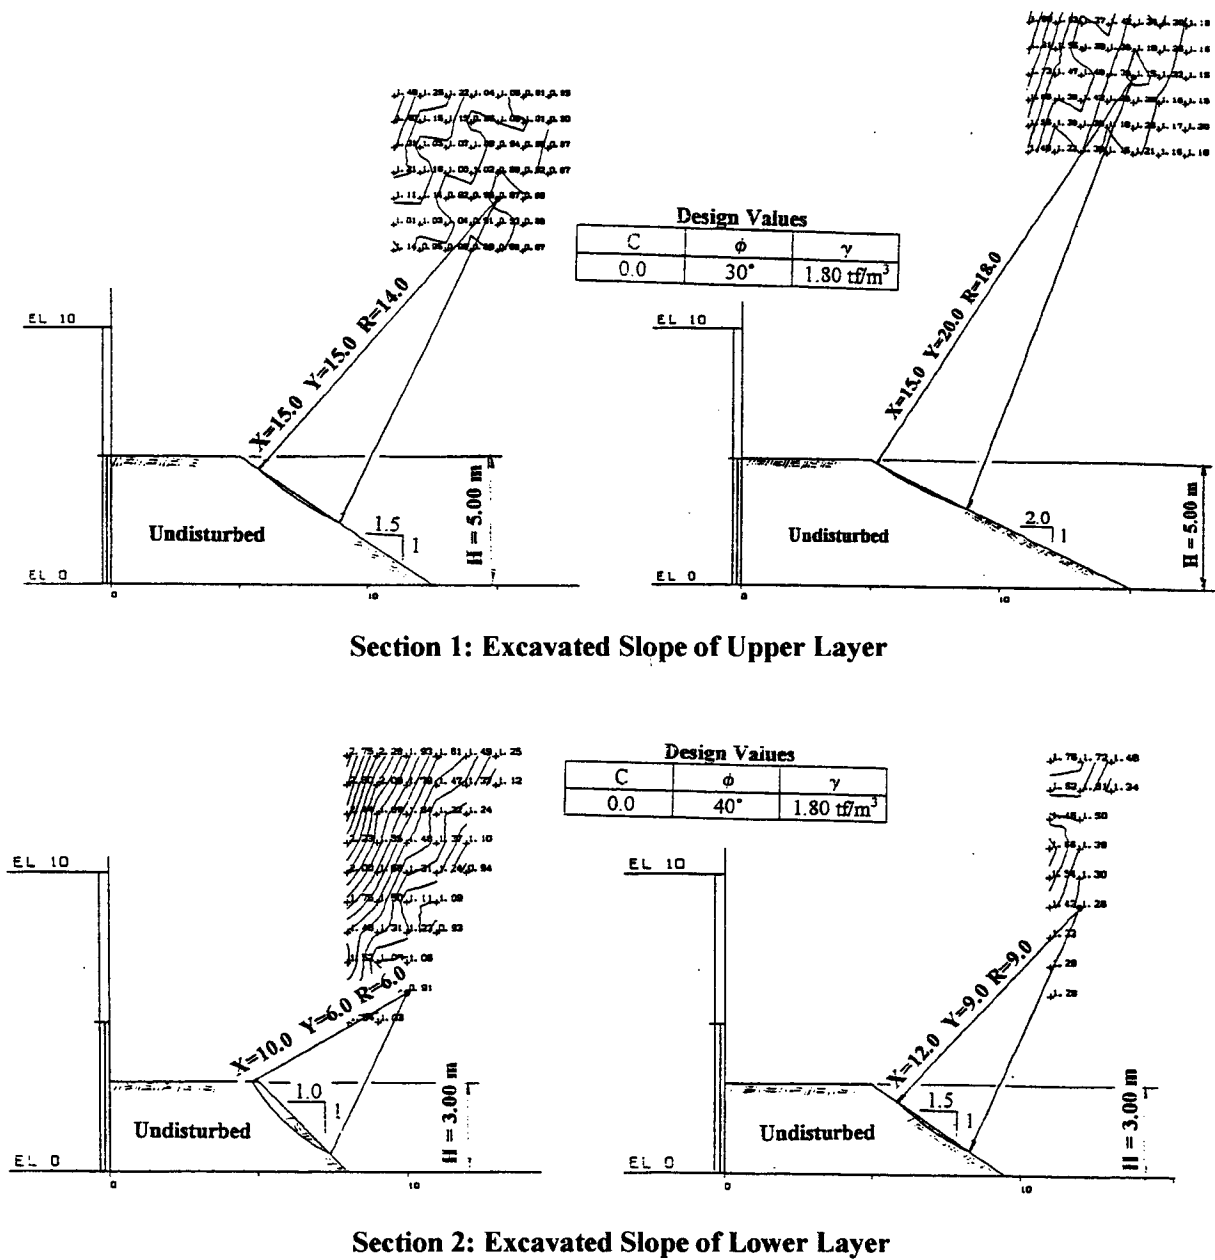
Slope Stability Analysis of Excavation of No.7 P.S.
